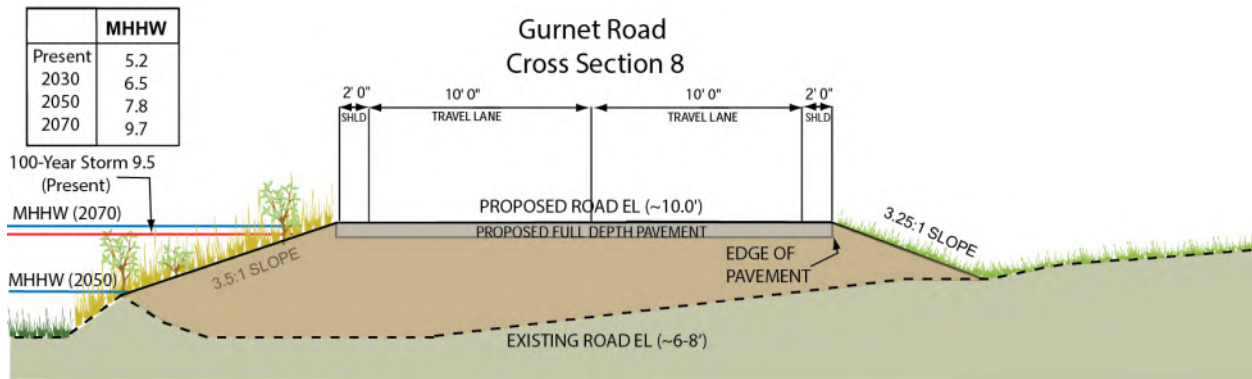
Gurnet Road adaptation plan at Cross Section 8
